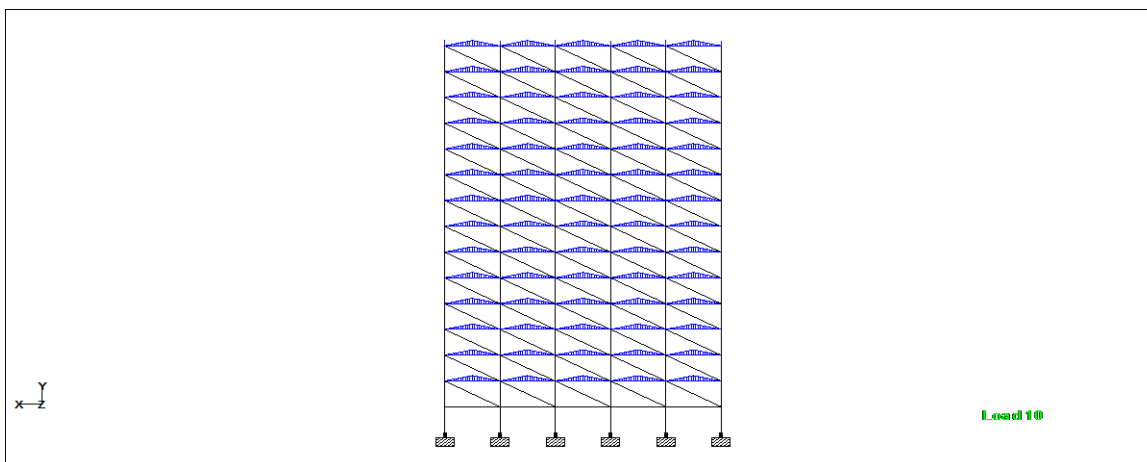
ELEVATION 3D-Frame Subjected to live Load
